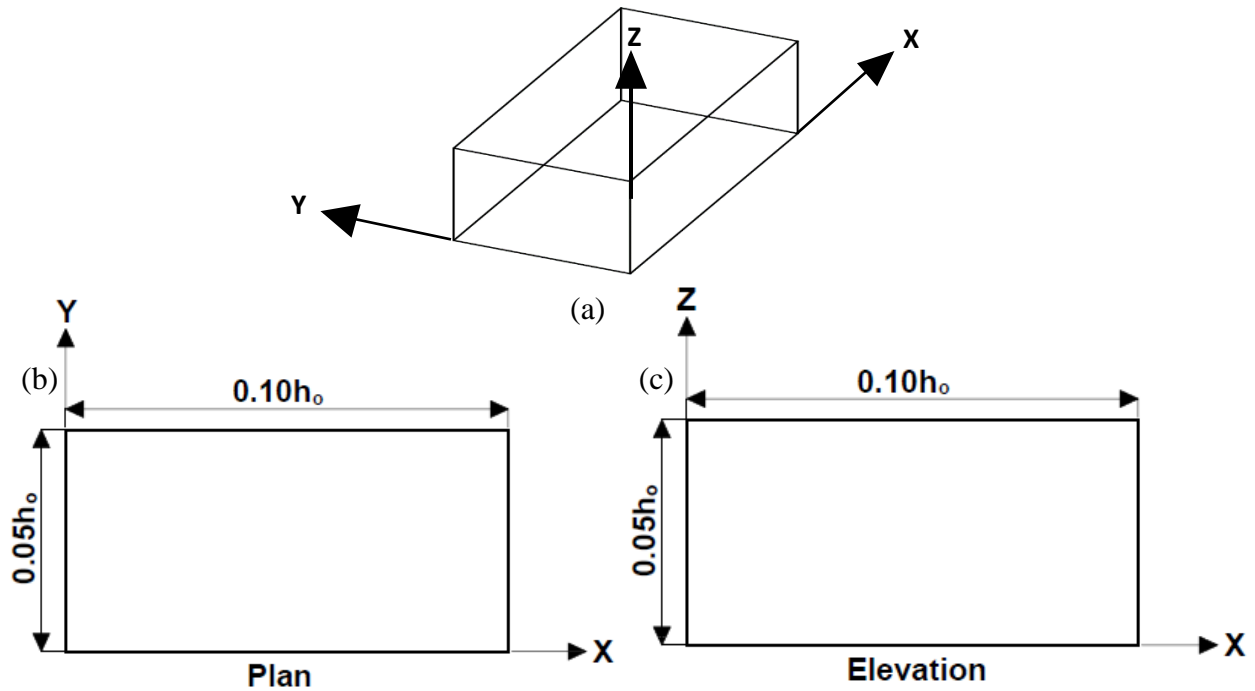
(a) 3D sketch of building model (b) 2D sketch of building – Plan (c) 2D sketch of building model – Elevation
